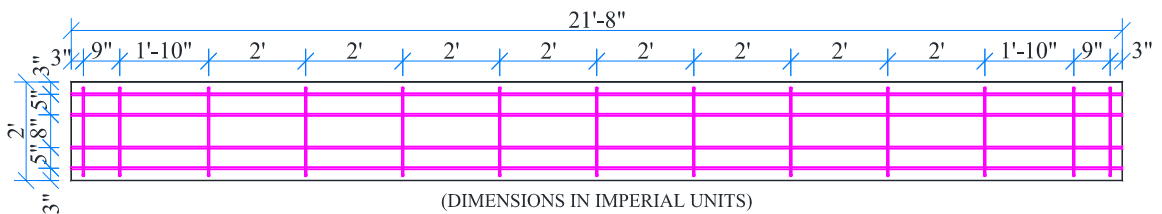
Stirrup Arrangement in Steel Prestressed Slab
